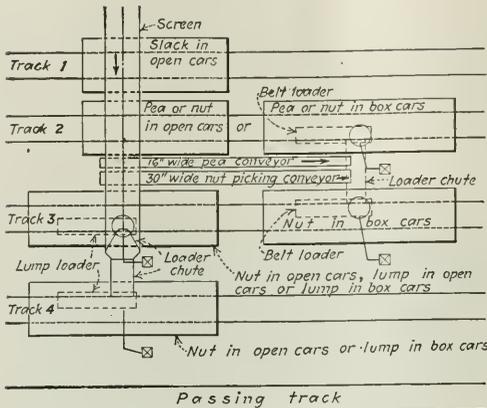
SCHEMATIC PLAN OF TIPPLE PLANT
